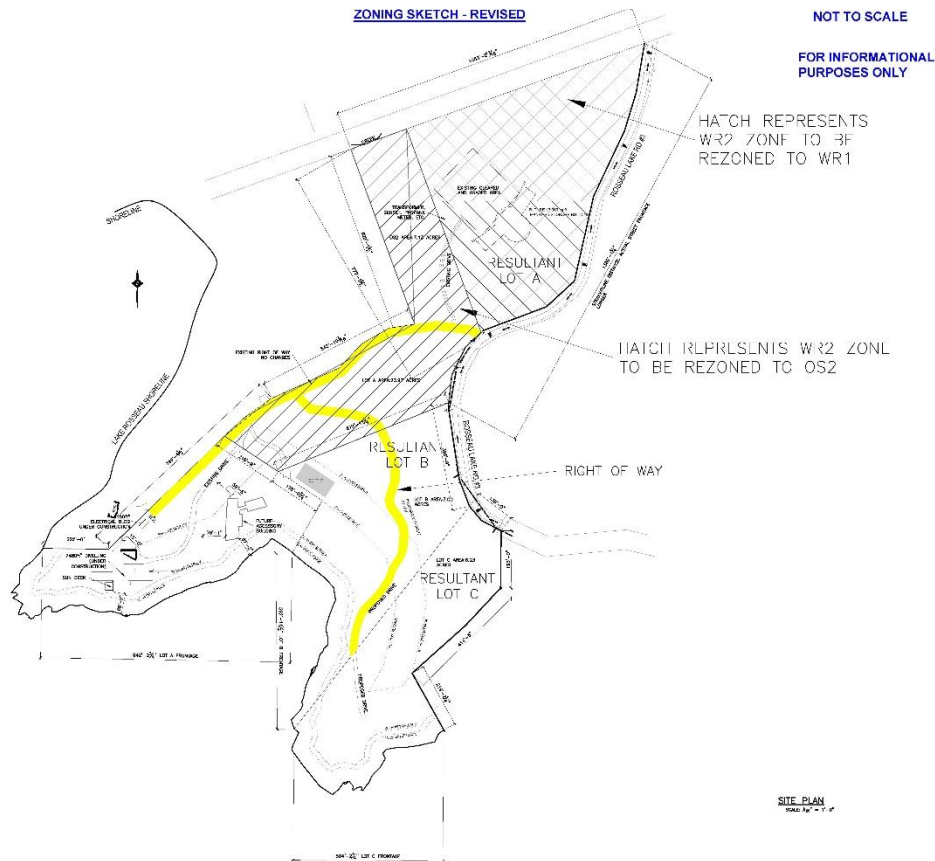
Revised rezoning sketch for ZBA/26/24 – Amended.
